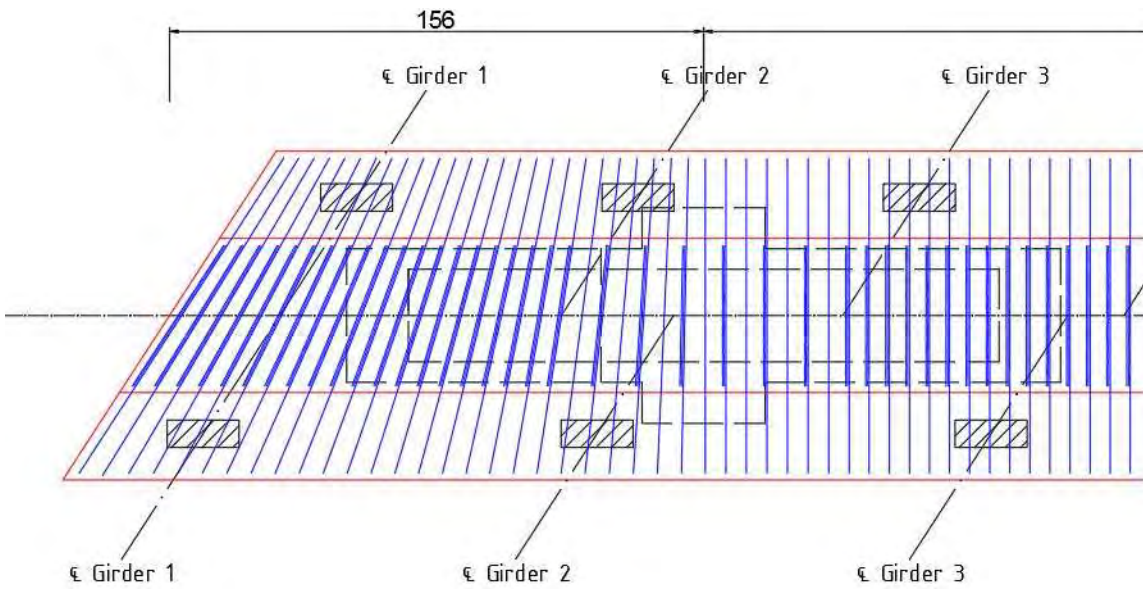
Case 2 for Bent 6 (Traditional Detailing of Reinforcement without End Bars, unit: inch)
